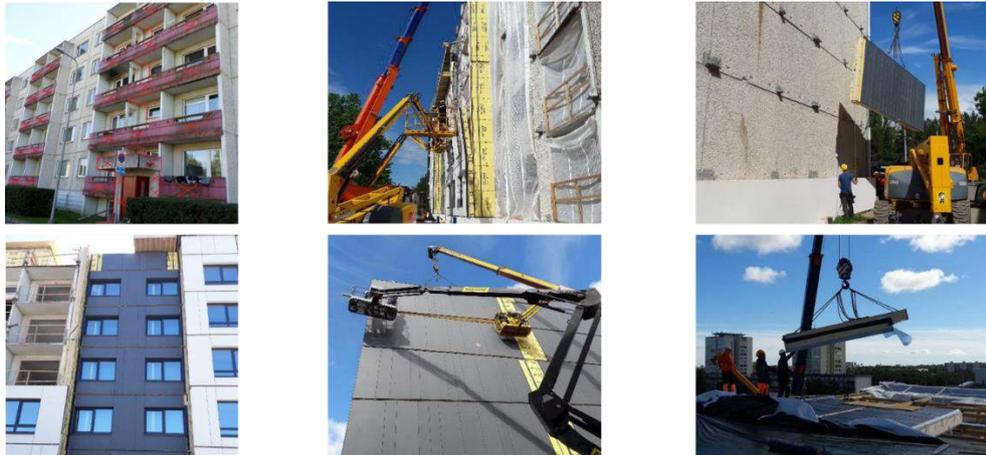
INSTALLATION OF MODULAR ELEMENTS AT THE ESTONIAN PILOT BUILDING - SUMMER 2017
